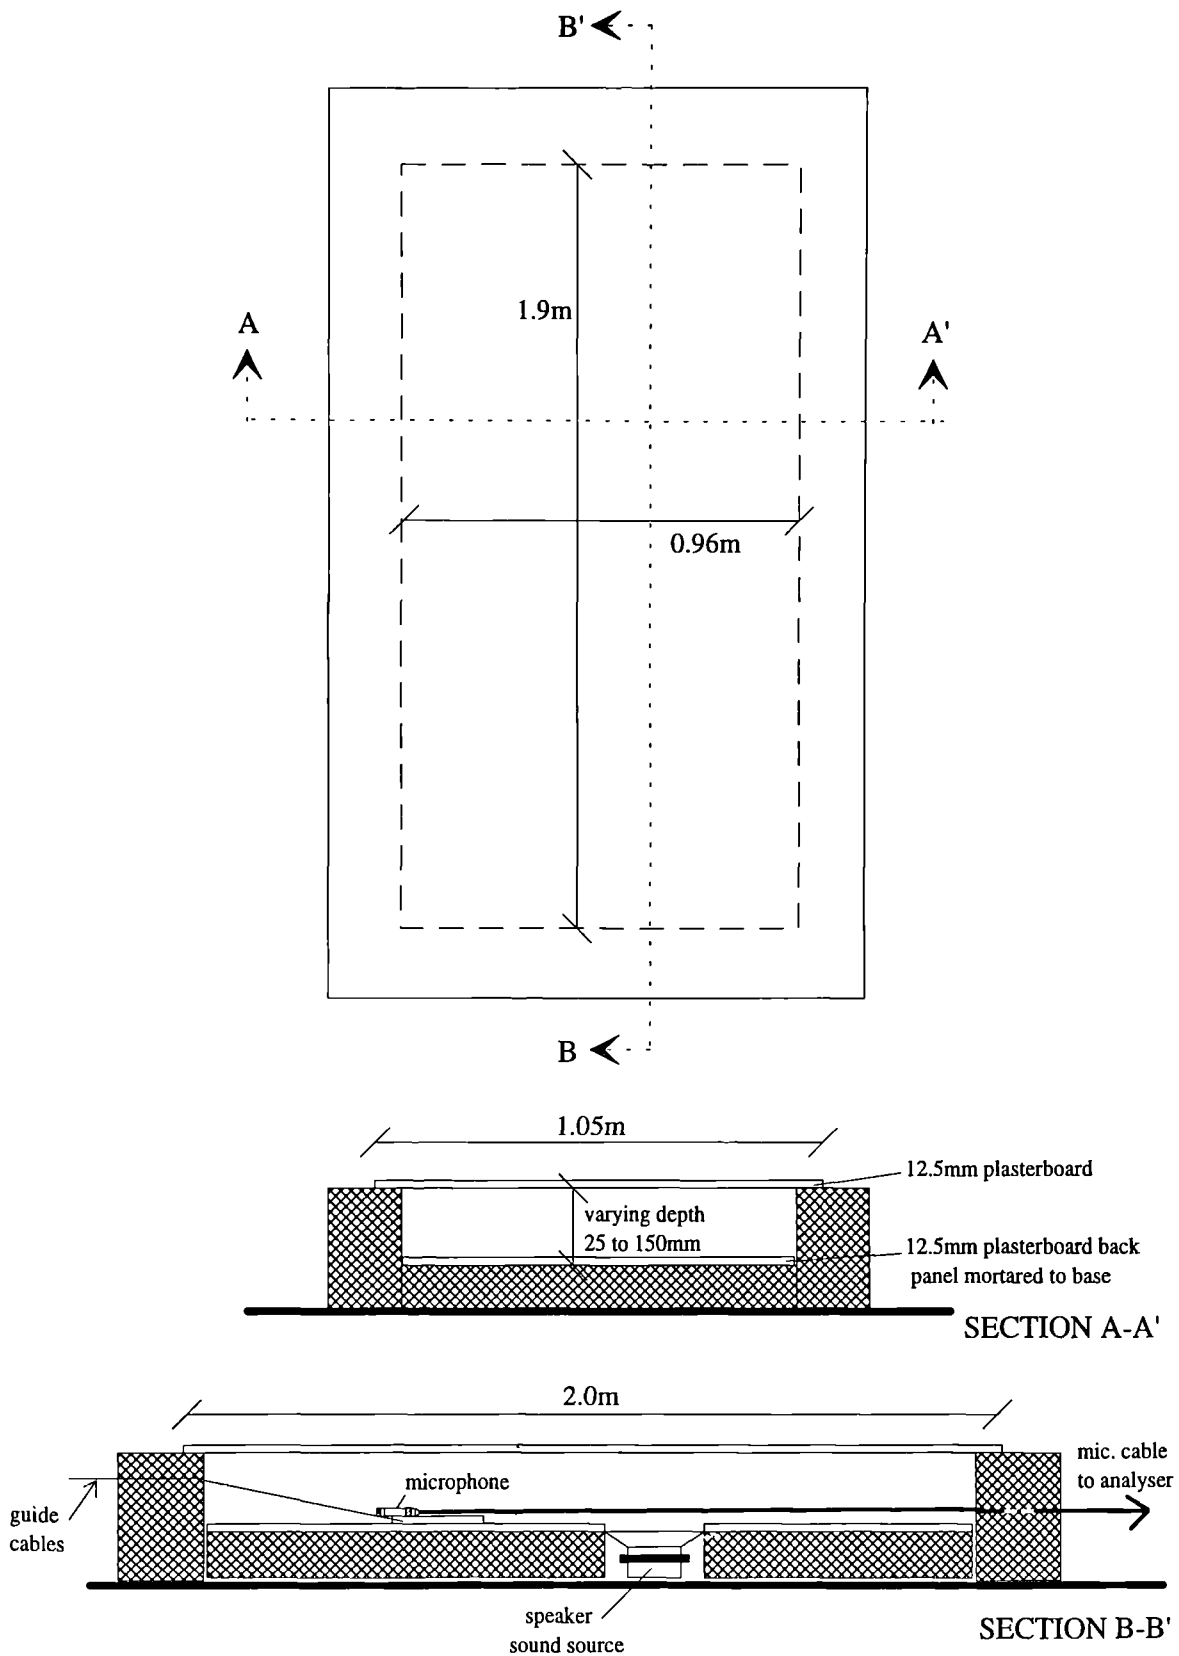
Sections and plan of cavity test structure with built-in speaker and microphone.
